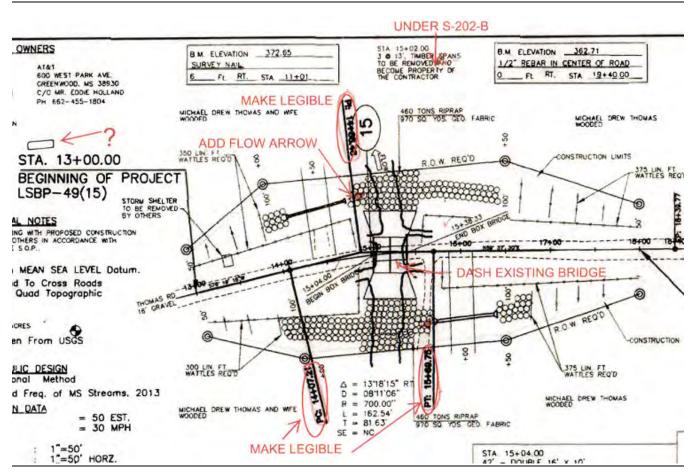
½ Scale Plan Sheets should be constructed as close to the layout of the State Aid sample plans as possible.
